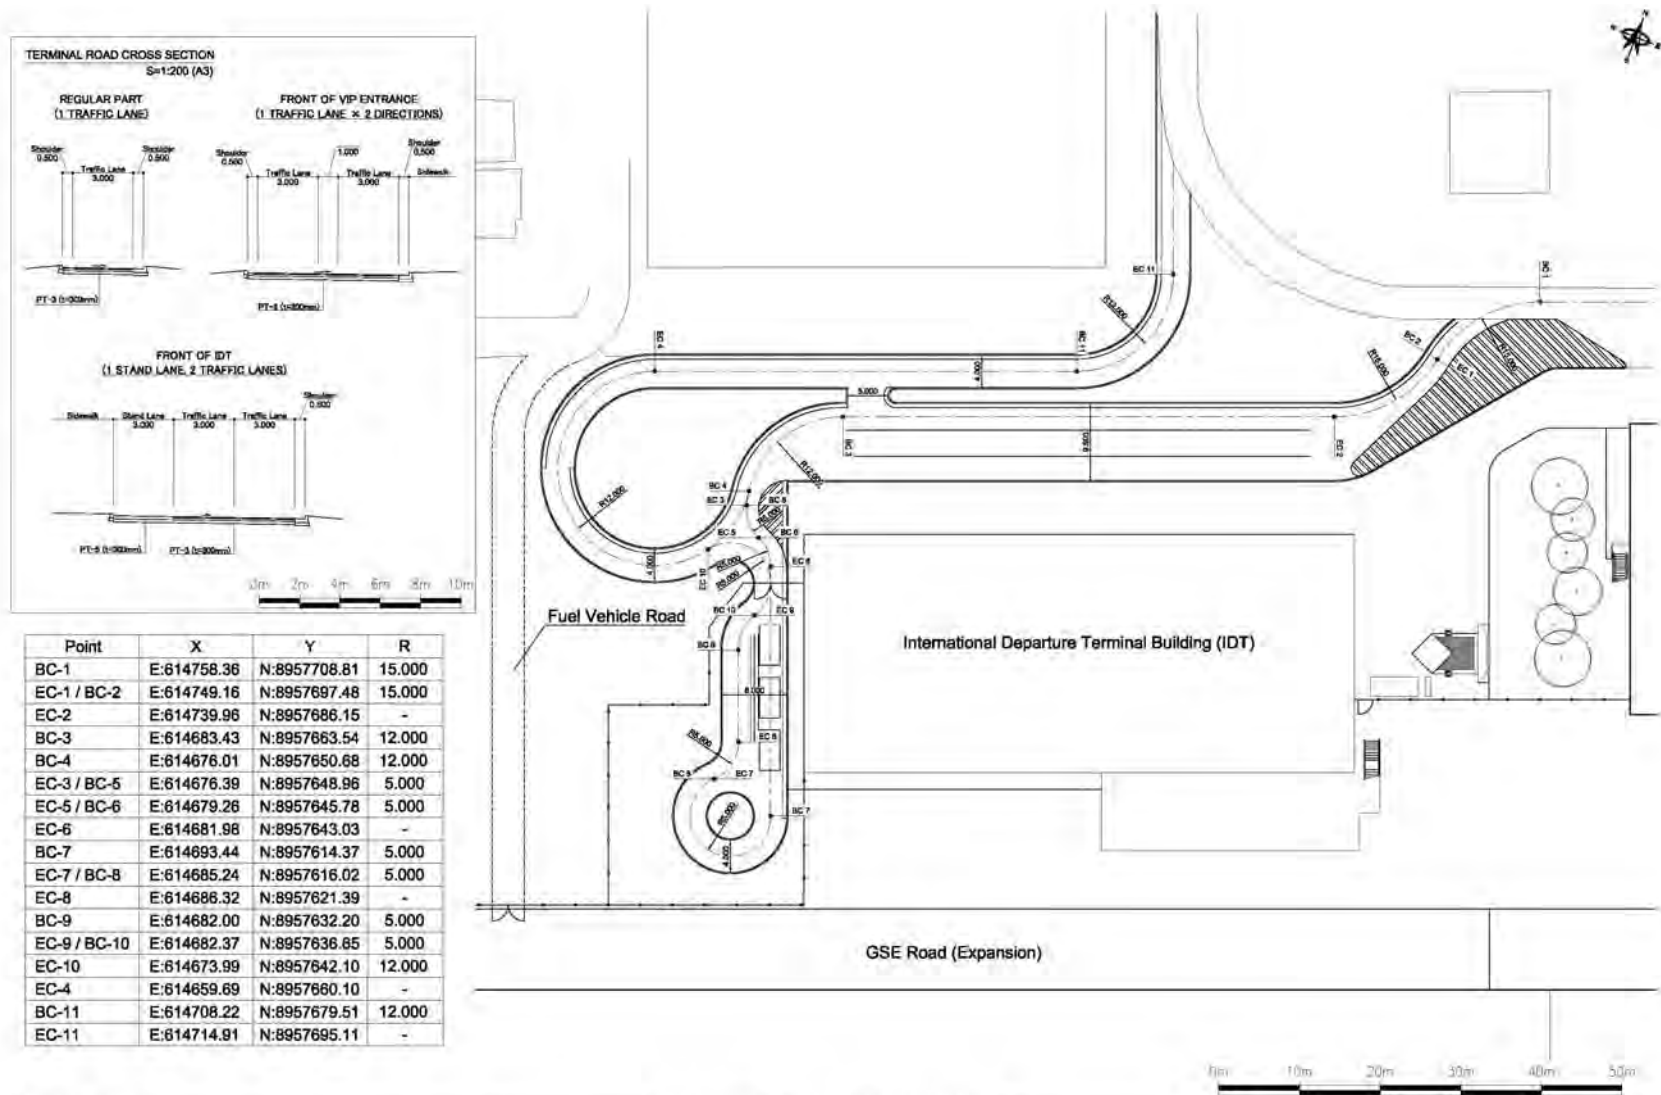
Terminal Road Layout Plan and Typical Cross Section
